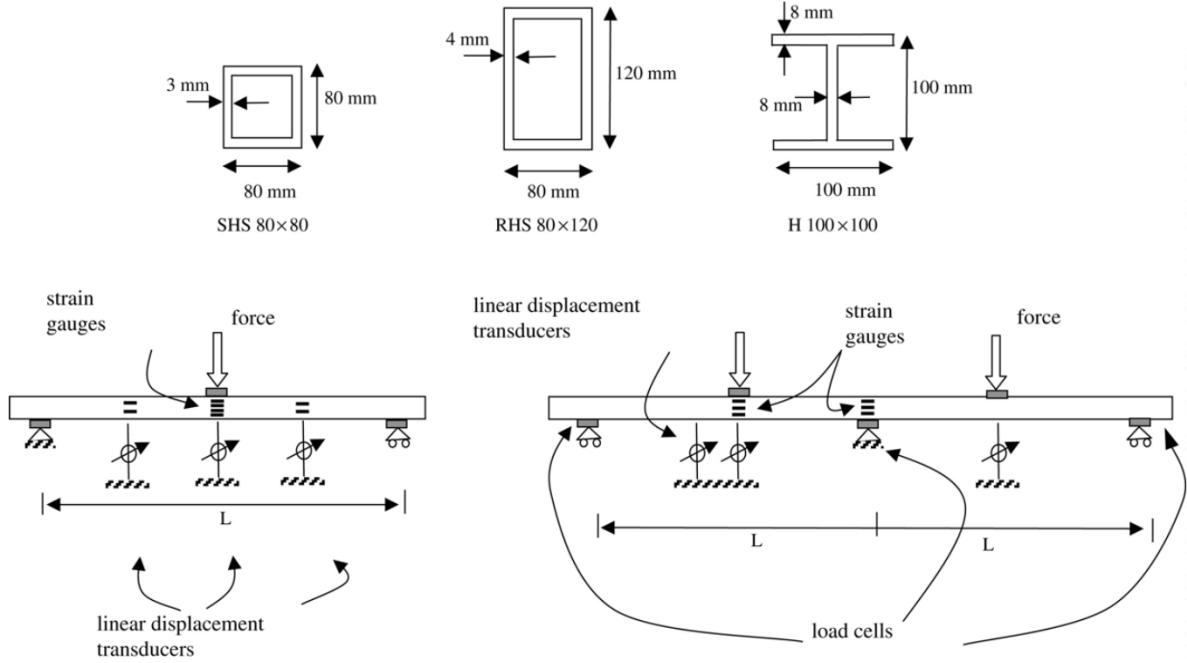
Instrumentation, cross-section and loading schemes of the tested beams.
